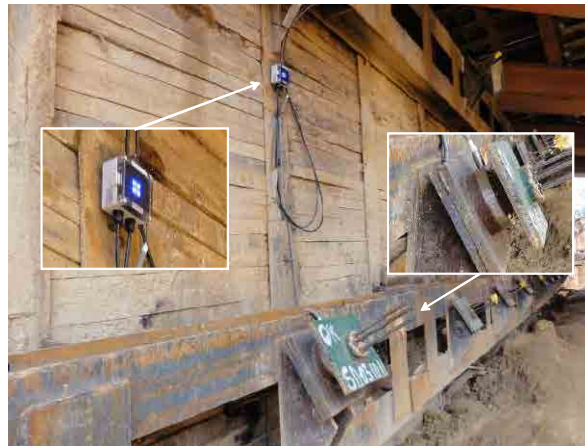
LEC installed to monitor inclination behind a retaining wall
